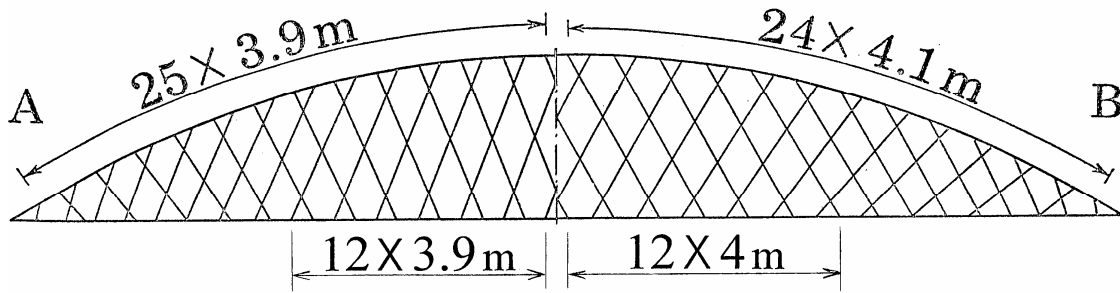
Arrangement of hangers for two bridges spanning 200 m
